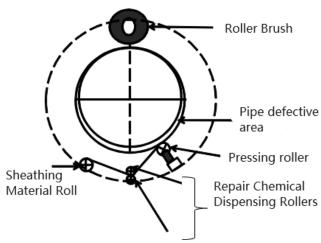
illustrates a cross sectional view of the apparatus while wrapping the sheathing material on a lower half surface of the pipe
